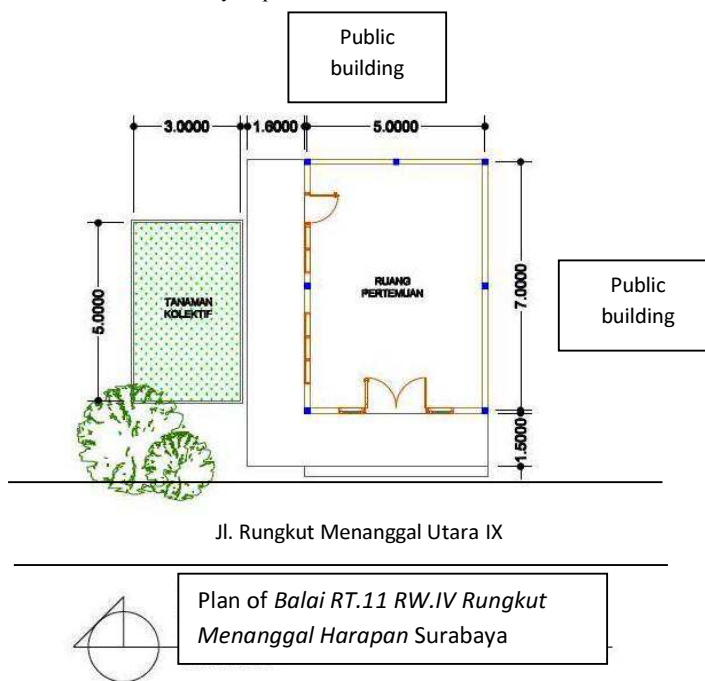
Building lay out of meeting room (*Balai*) RT.11 RW.IV Rungkut Menanggal Harapan
